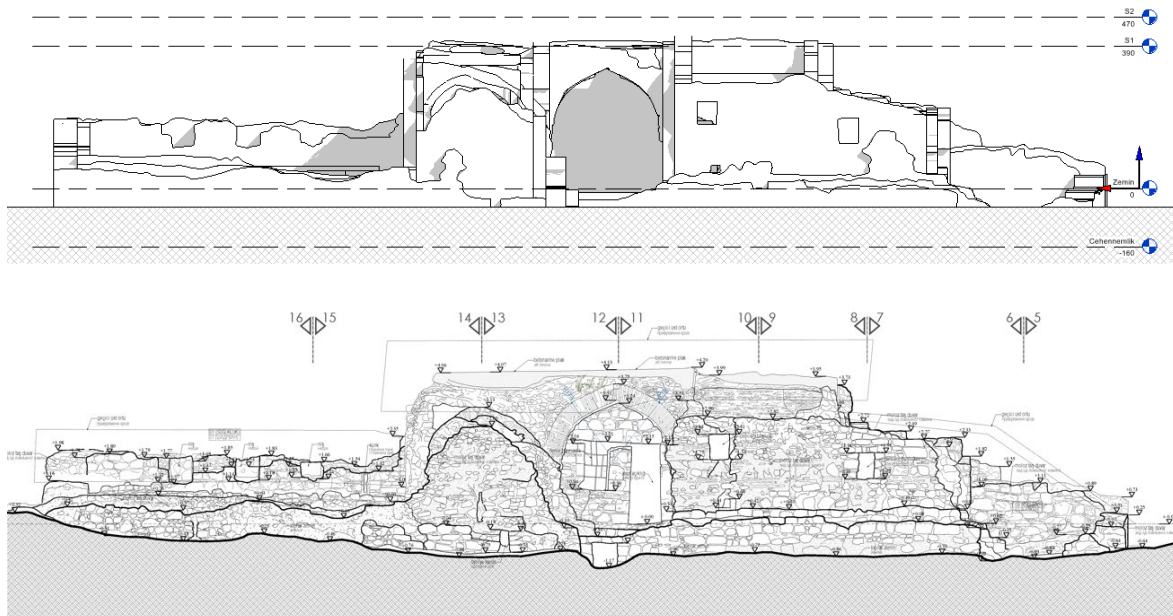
Comparison of elevation, (a) Revit elevation, (b) AutoCAD elevation
